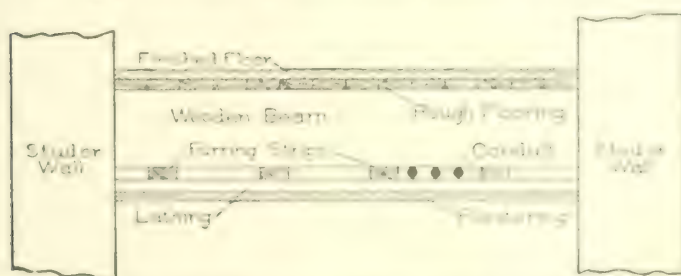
Electric Conduit Run Concealed under Floor in Wooden Frame Building.
